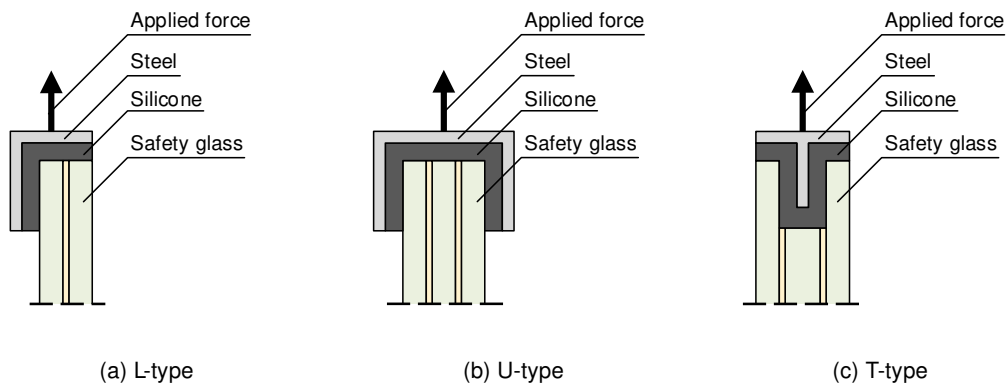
Steel to glass adhesive connections with complex geometries (Hagl, 2007)
